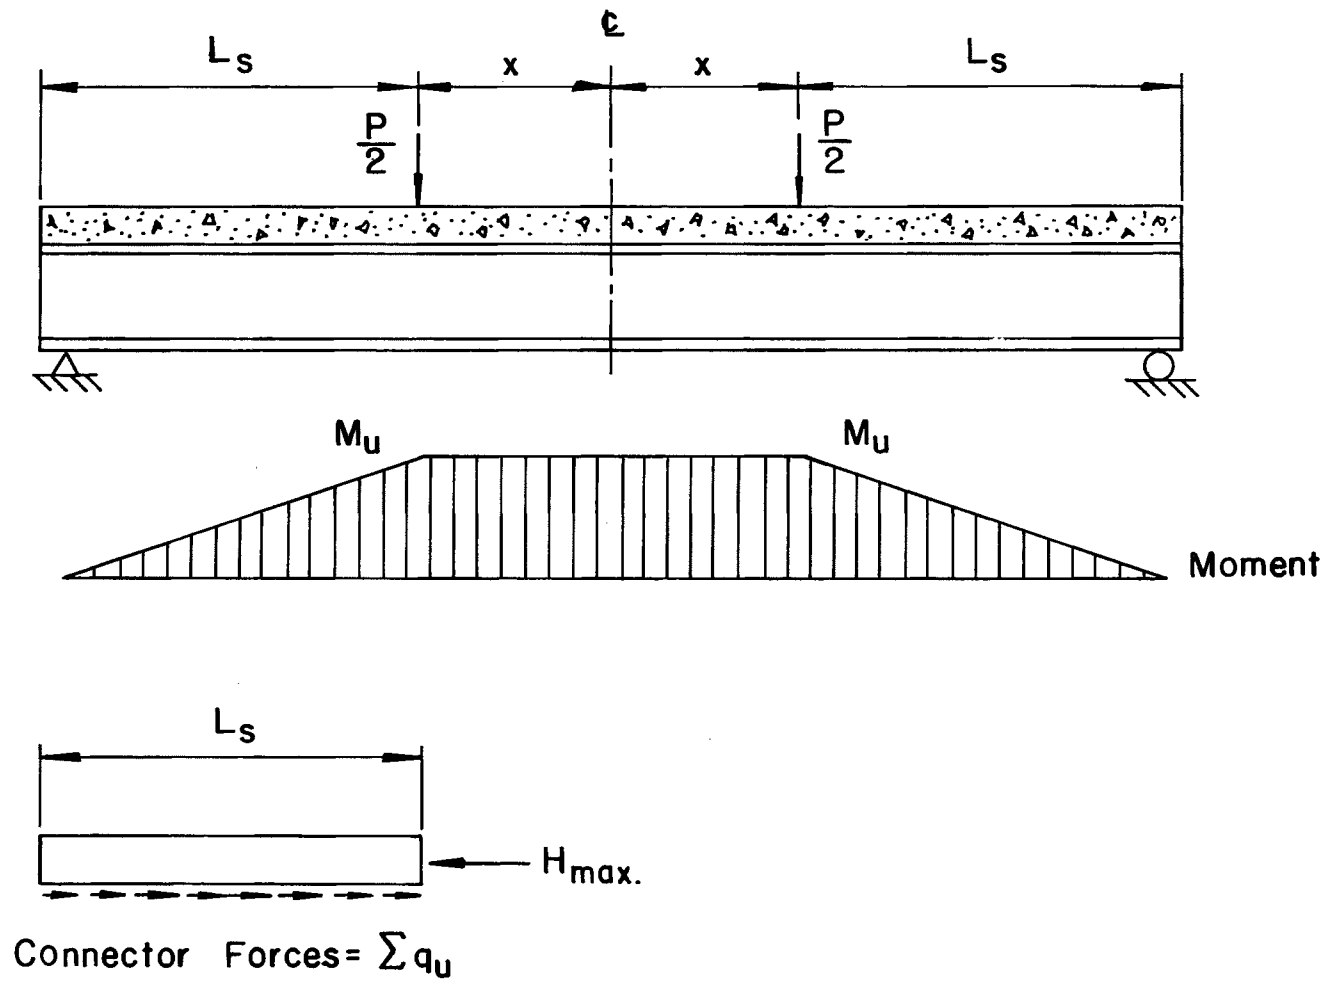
SHEAR CONNECTOR FORCES AT ULTIMATE LOAD FOR A SIMPLE SPAN BEAM
